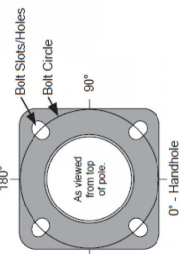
DETAIL A: SURFACE MOUNTED LIGHTING FIXTURE
